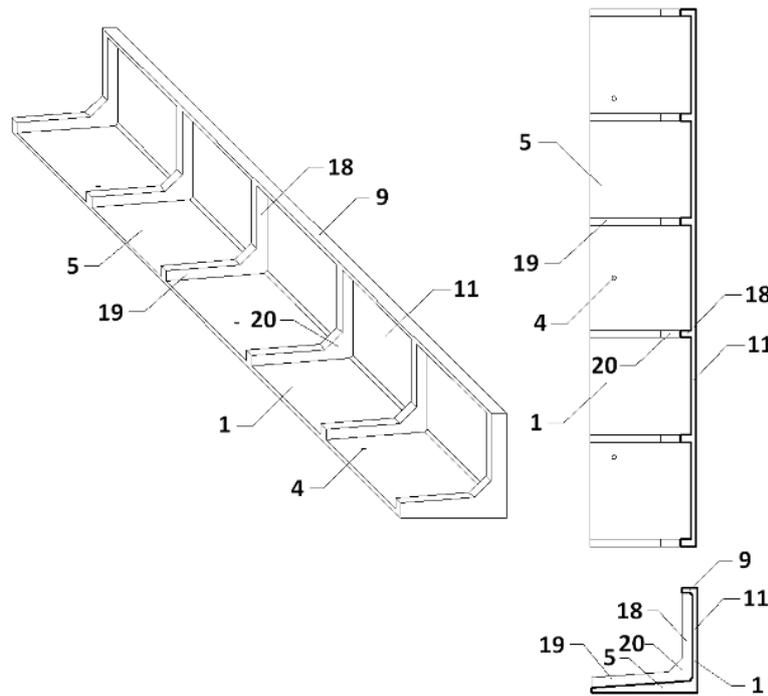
Precast parapet block. *Notes:* 1 - parapet block, 4 - anchoring of parapet block, 5 - horizontal part of parapet block, 9 - the upper part of the parapet block, 11 - vertical part of parapet block, 18 - vertical reinforcement rib of parapet block, 19 - horizontal reinforcement rib of parapet block, 20 - rib reinforcement.
